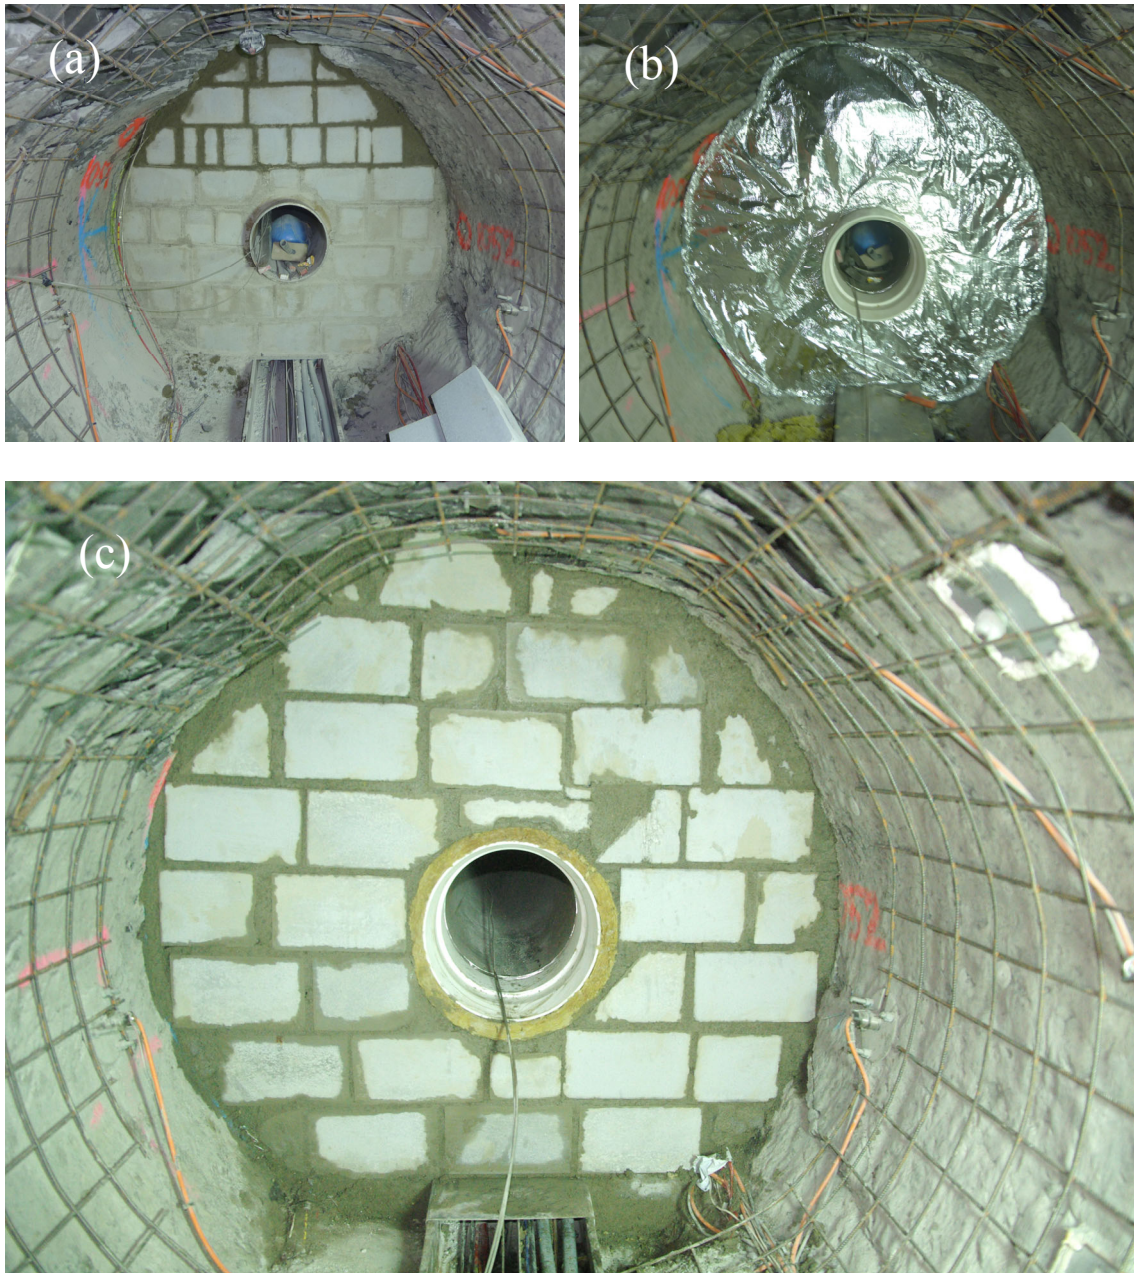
Plug #2: (a) First wall as completed; (b) application of isolation system and vapour barrier; (c) second wall as completed.
